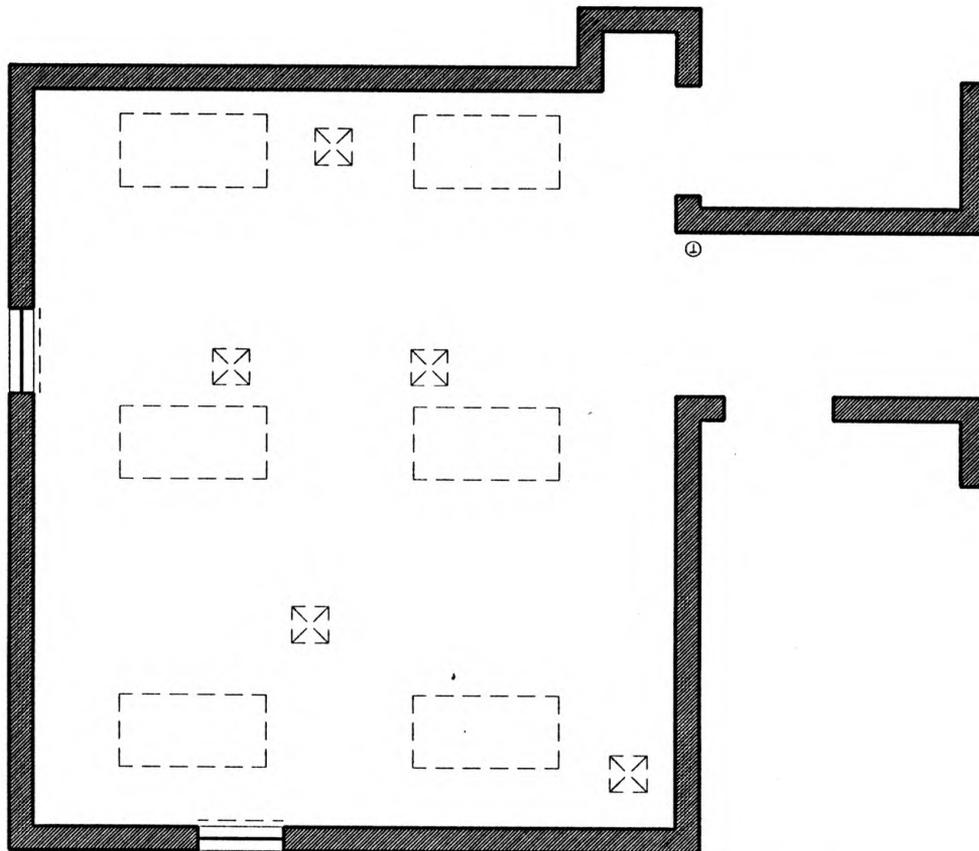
Plan of Skilled Care Work Area - Site 1.
